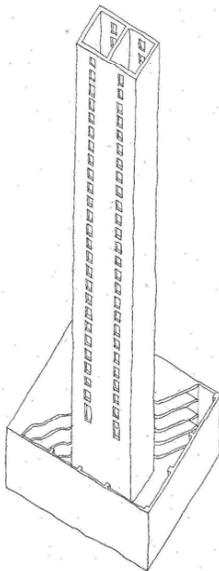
Example of core wall building with below grade structure that creates podium effect.
